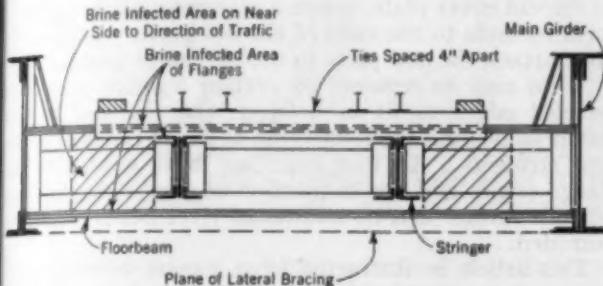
TYPICAL SECTION THROUGH A PLATE-GIRDER BRIDGE
